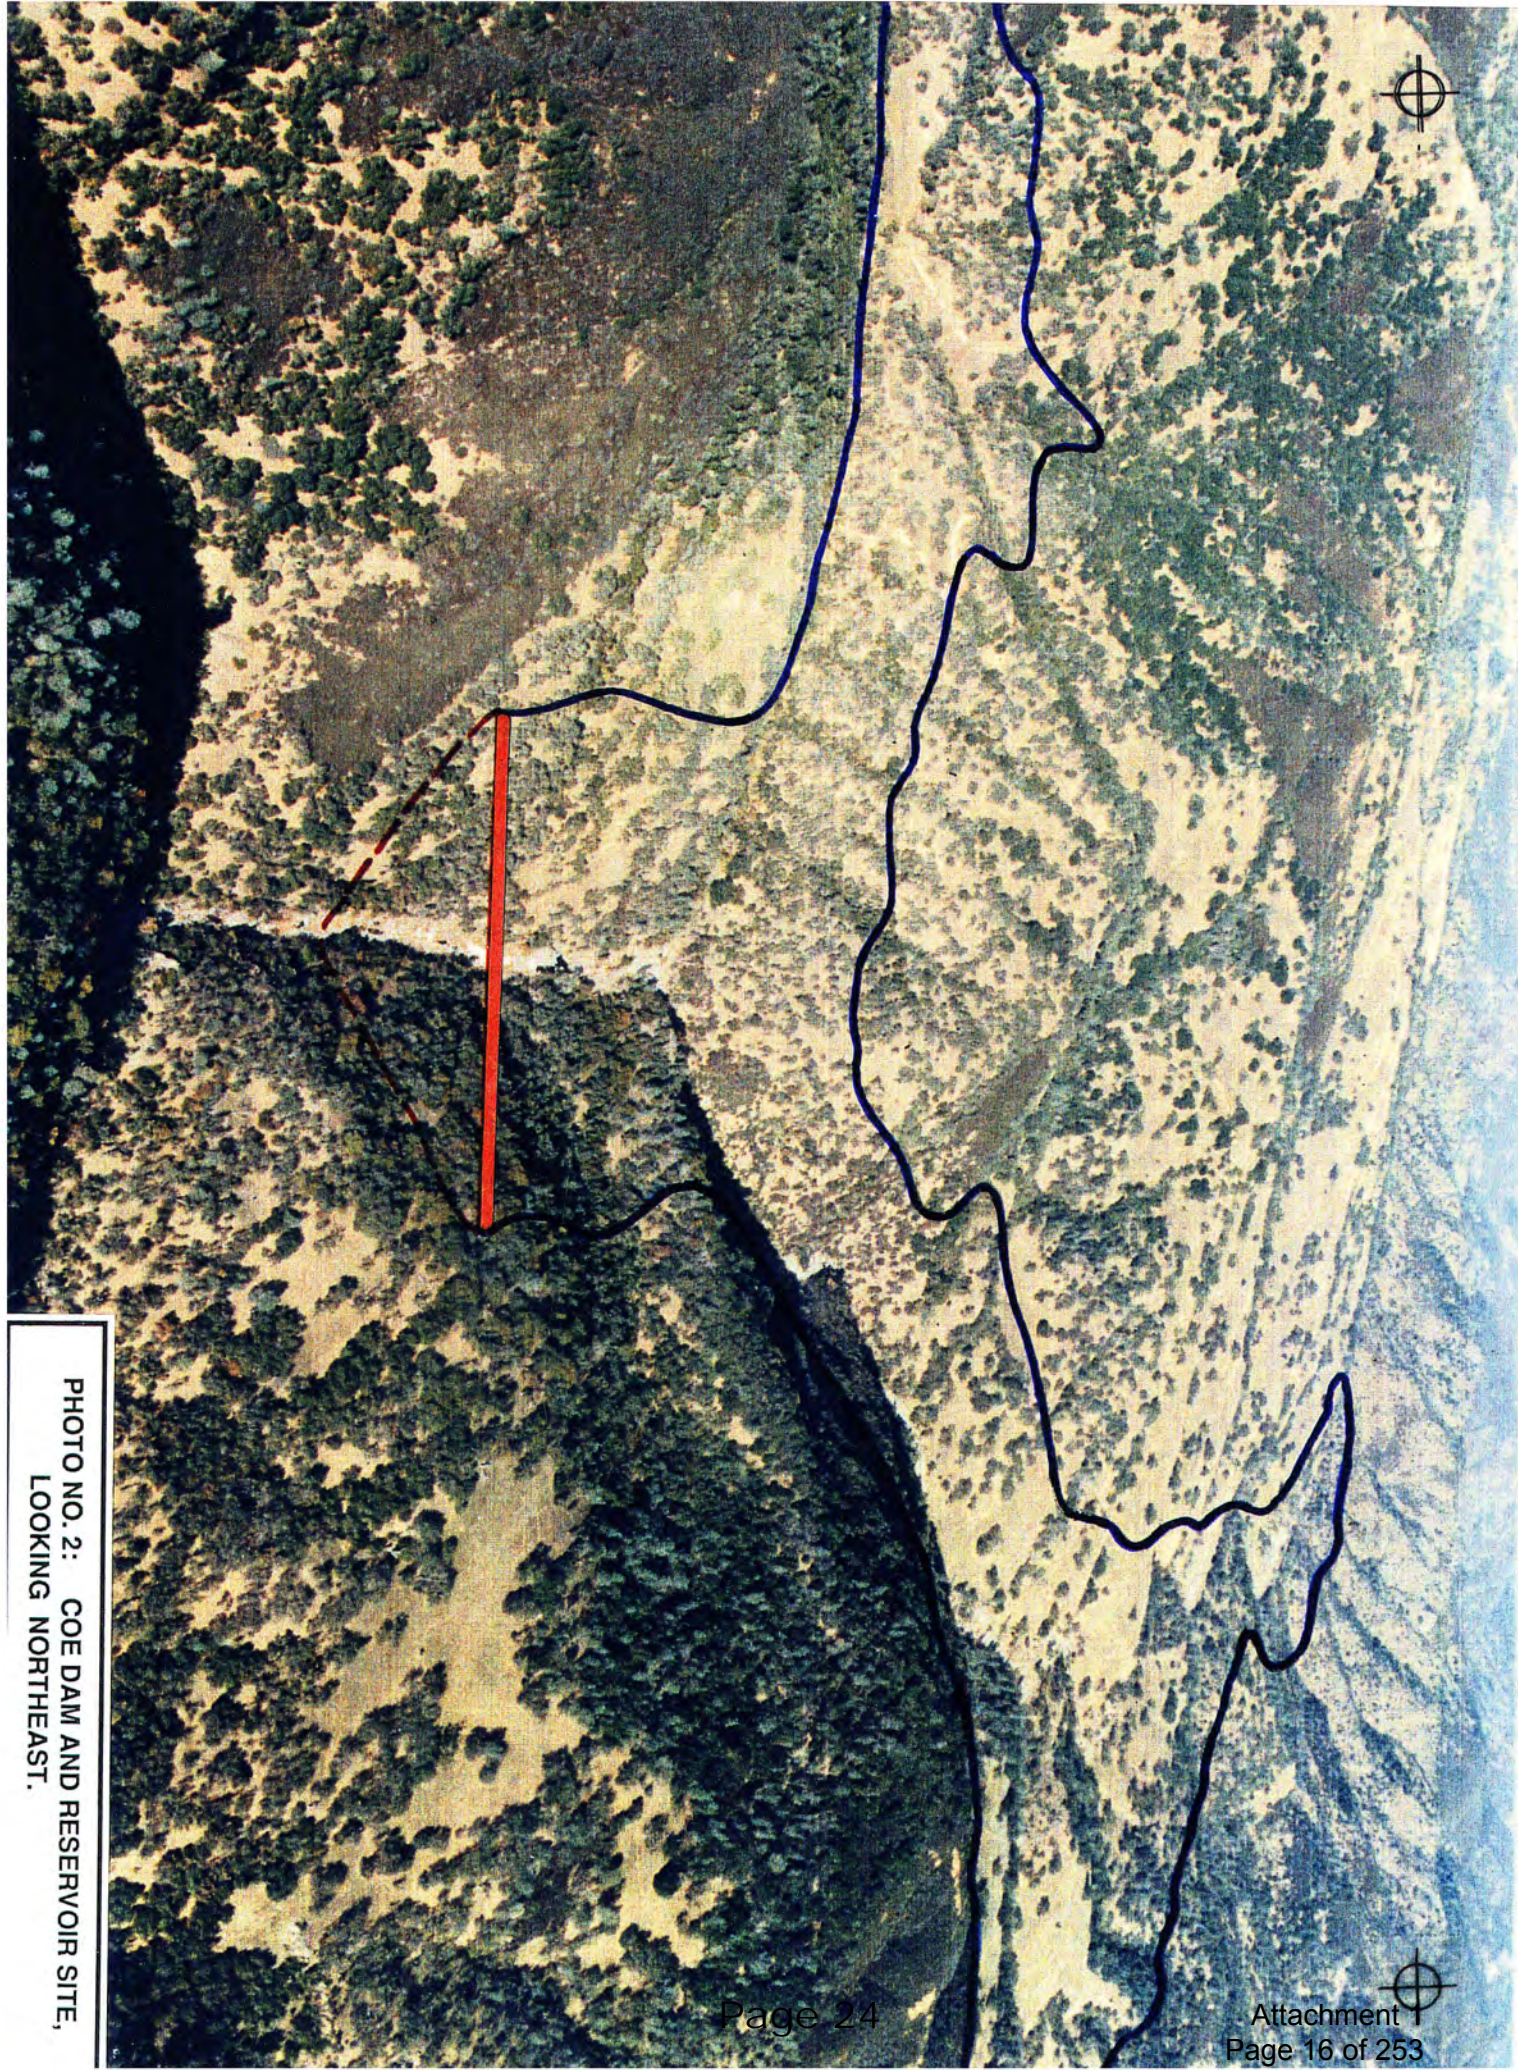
COE DAM AND RESERVOIR SITE,
